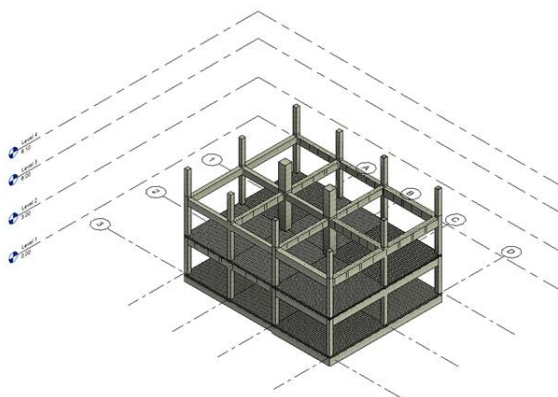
Building Information Model for a Case Study Office Building: A Three-Story Office Building Project
